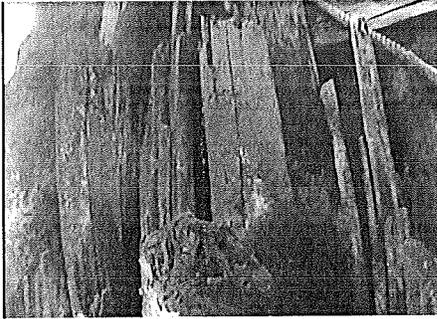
South fender system, dolphin at east end of fender, showing typical broken and full height piles in poor condition due to rot, impact damage and worms, looking southwest.
